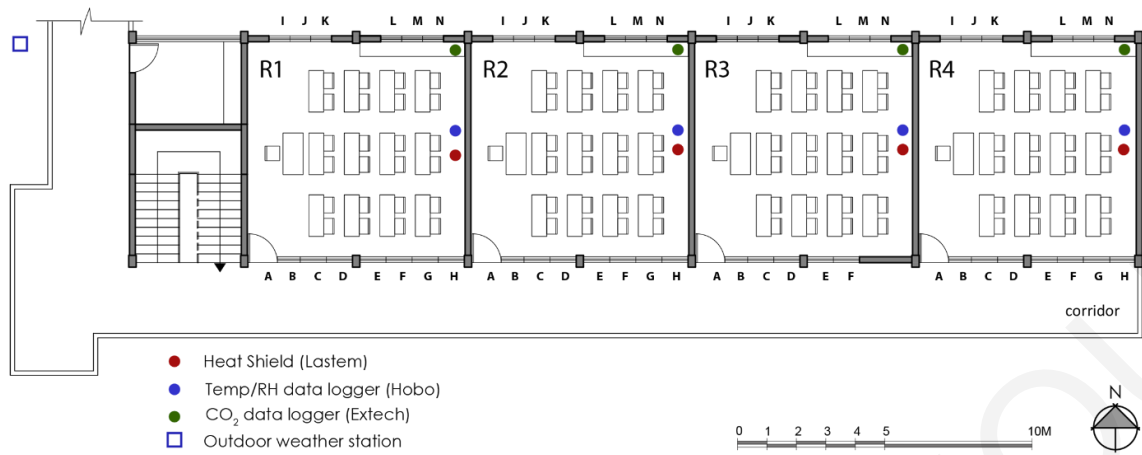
Plan layout of a typical classroom of secondary schools in Cyprus where the openings A to N, and the locations of the installed recording equipment, for indoor and outdoor environmental conditions are indicated.
